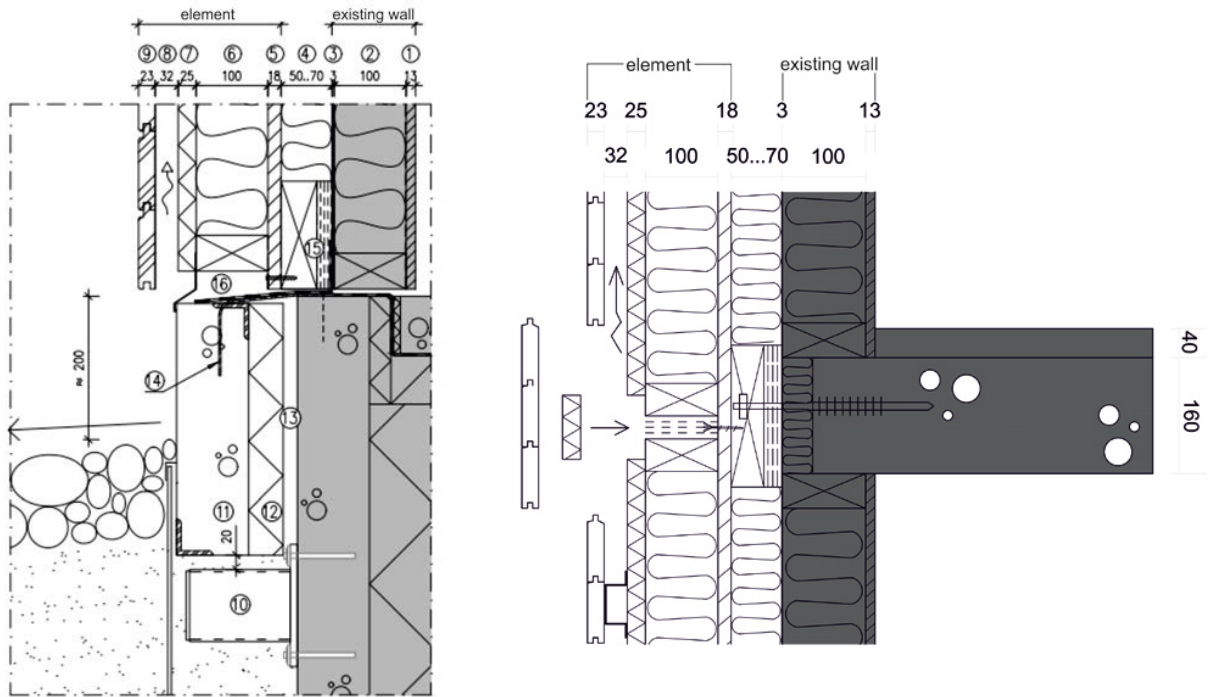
a) Connection to the plinth b) Vertical element at intermediate floor [14].
